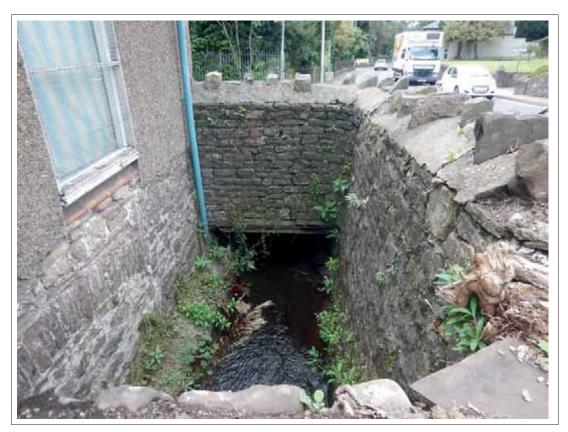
Culvert to the front of the out-building to the south-west corner of the curtilage, looking south.
